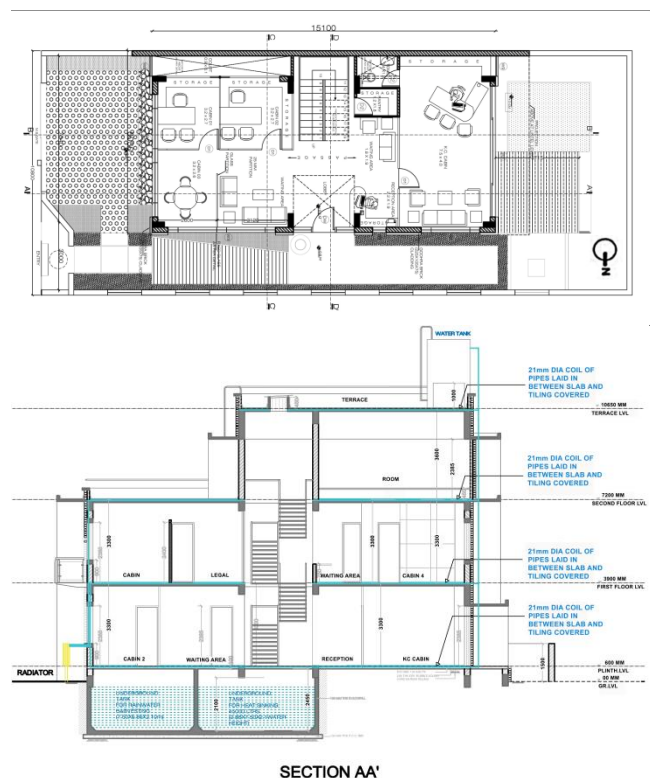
(a) Plan and (b) Section of the office building in Nashik
